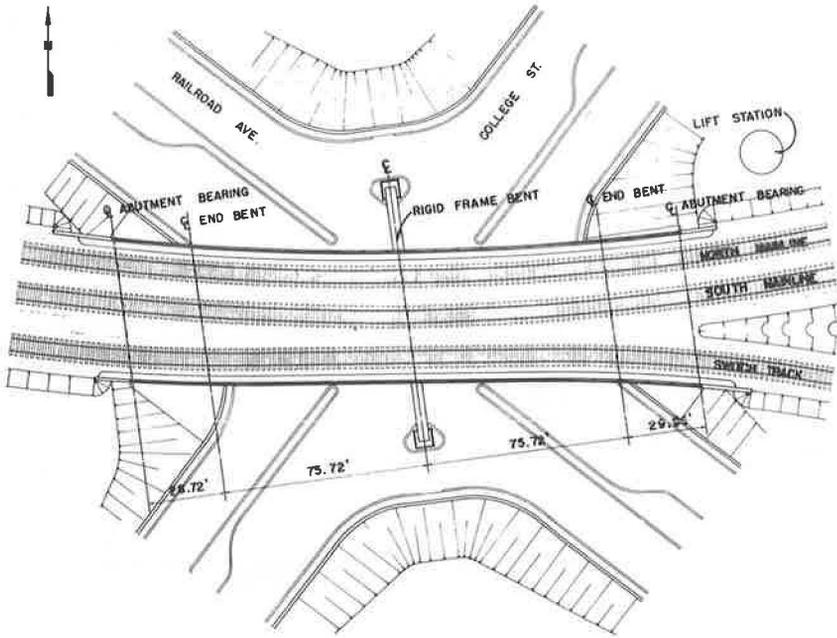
Plan of 212-ft long railroad overpass, Beaumont, Texas; central support is a 96-ft long welded rigid frame bent of ASTM A 514 D and E steels.
